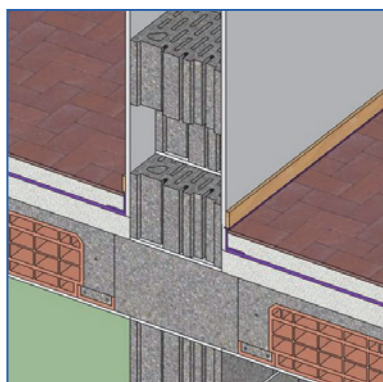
Typical Italian monolithic wall with expanded clay and concrete blocks.
